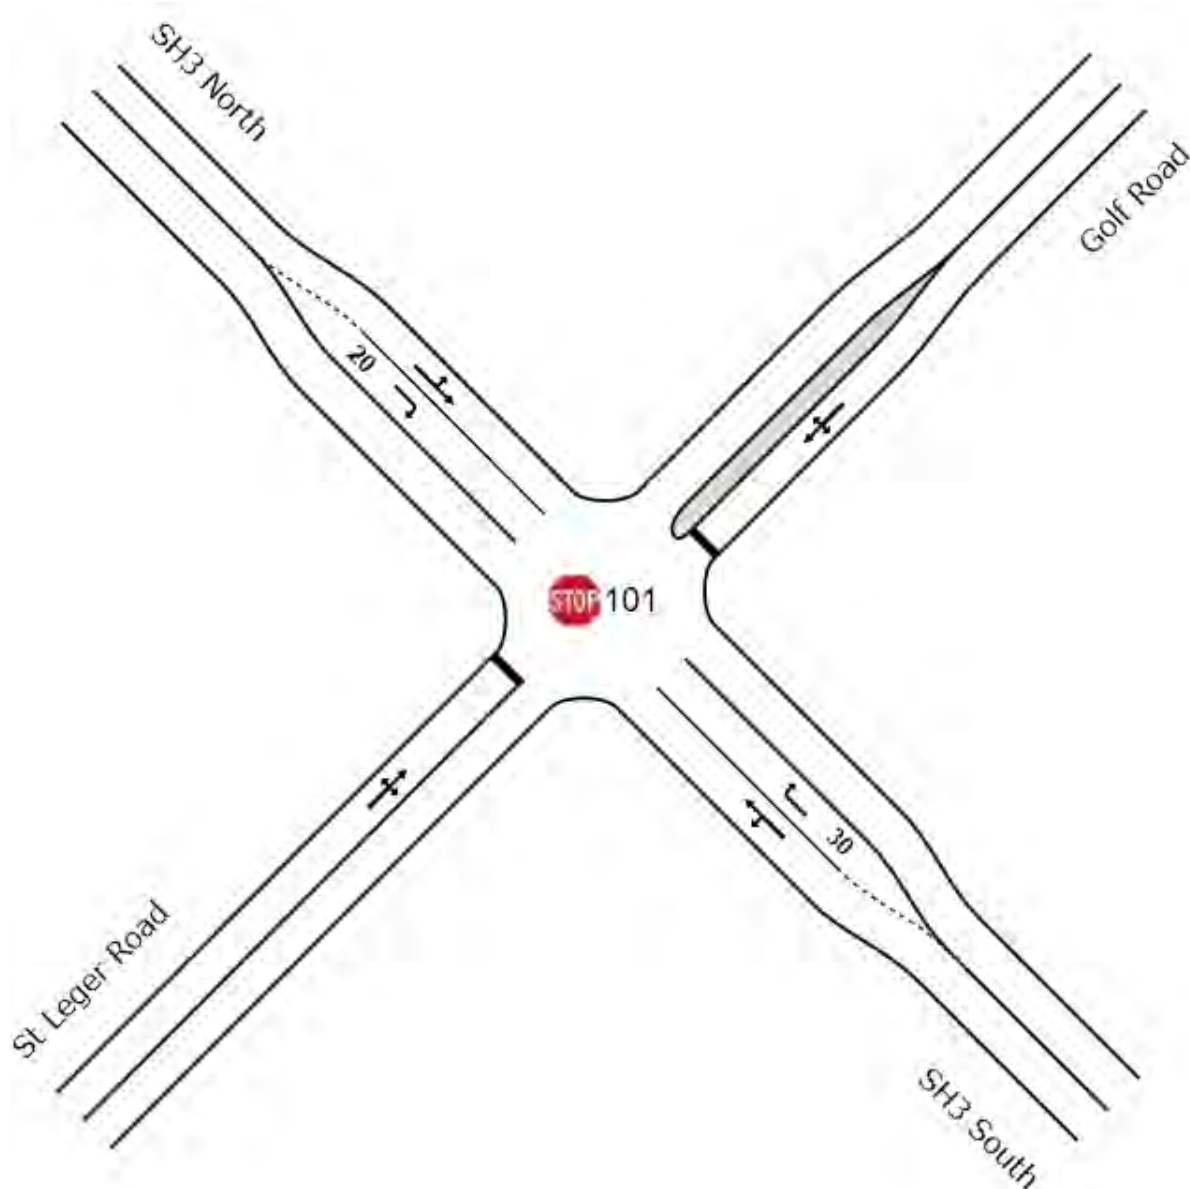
Sidra Intersection Diagram – State Highway 3 / Golf Road / St Leger Road
